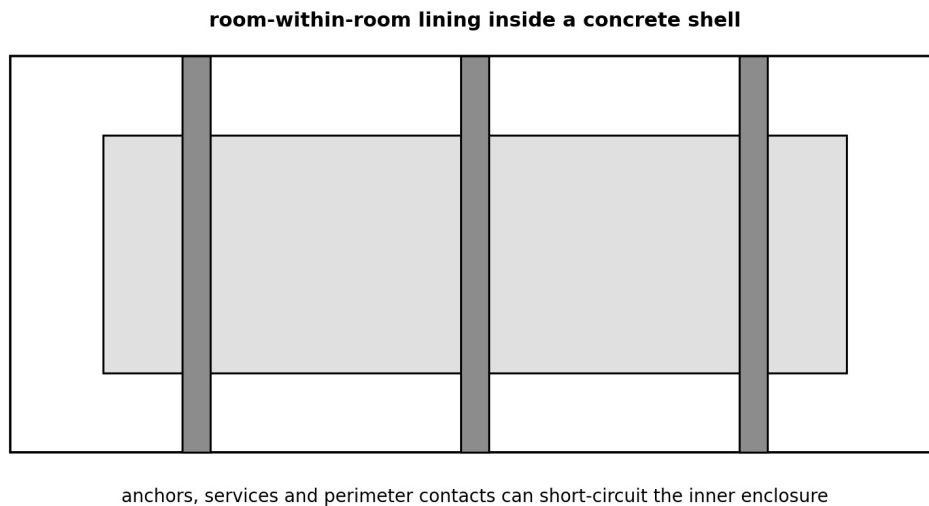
Room-within-room construction inside a concrete shell with isolated floor, independent walls, isolated ceiling and controlled service transitions. Author's original schematic.
